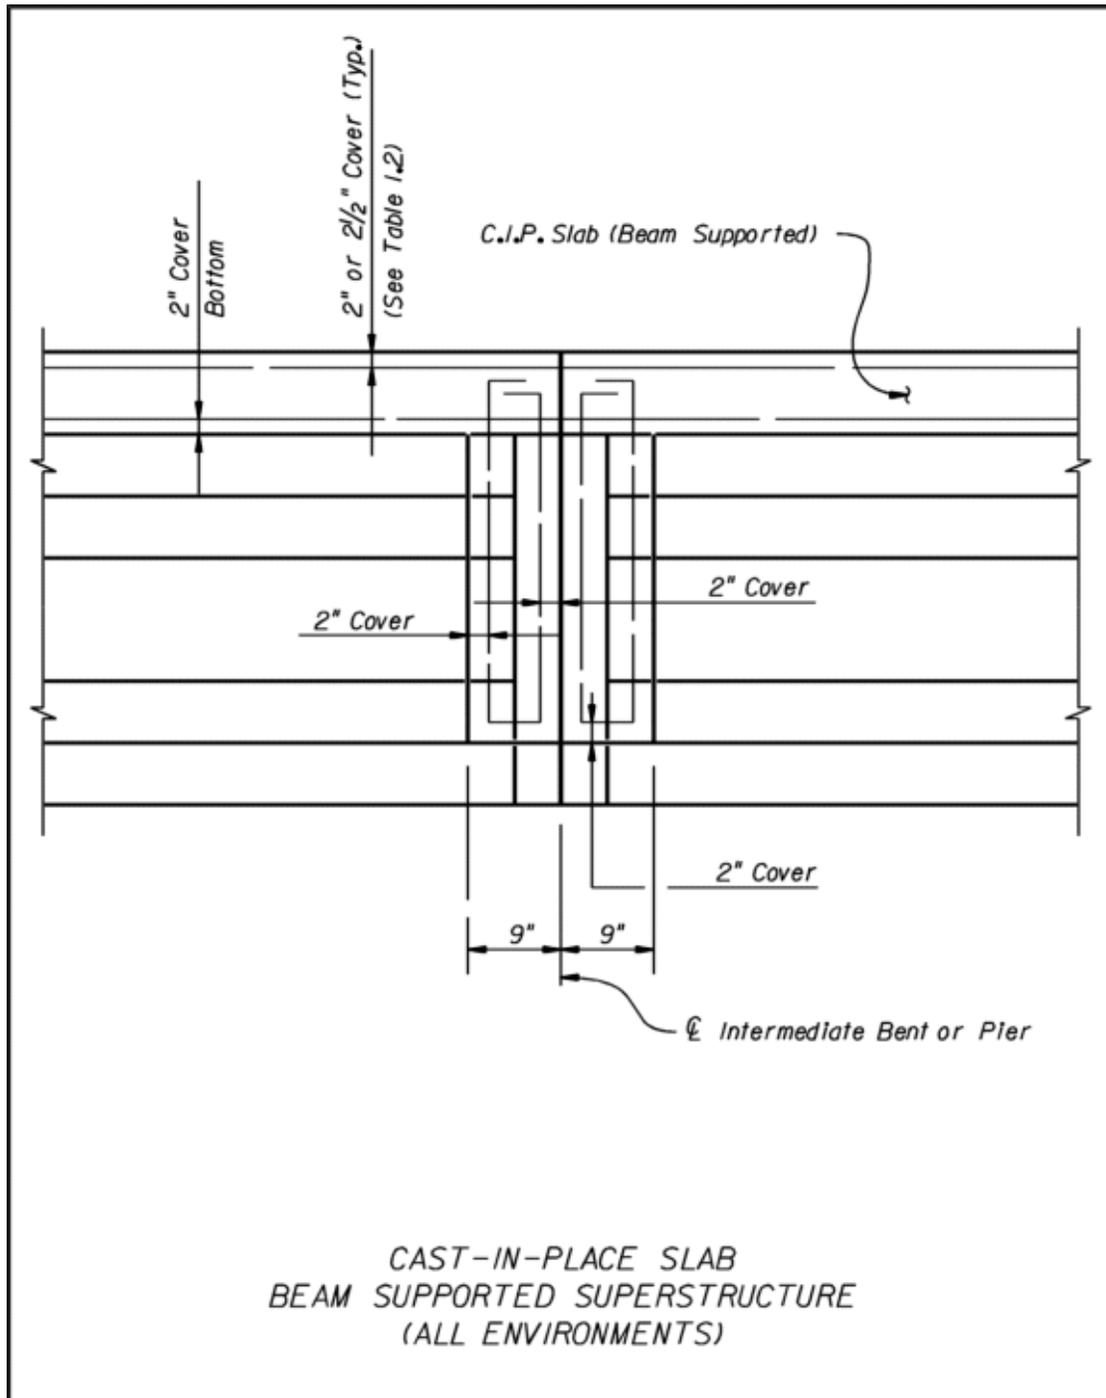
Cast-in-Place Slab with Beam Supported Superstructure (All Environments)
